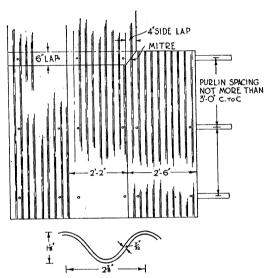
Standard-section asbestos-cement corrugated sheets fixed to wood purlins Dimensions required by Specification No. 690–1936.
